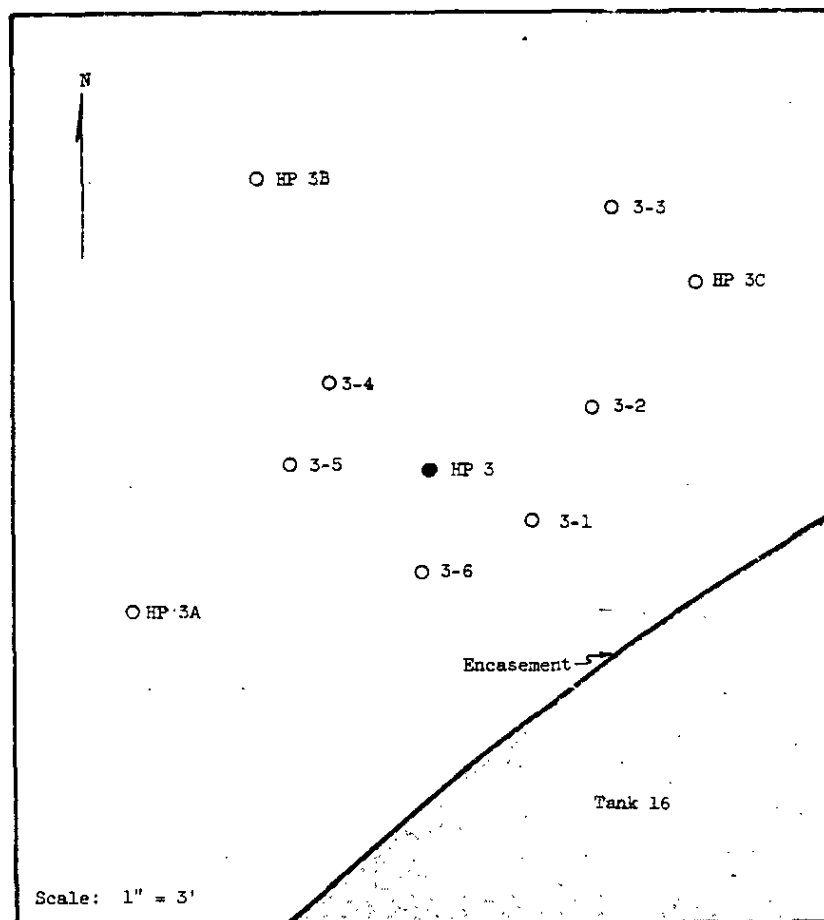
LOCATION OF BUILDING 241-H WELLS
